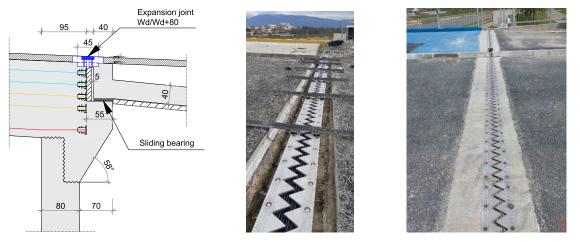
Detail of an abutment, carriageway and sidewalk expansion joint
